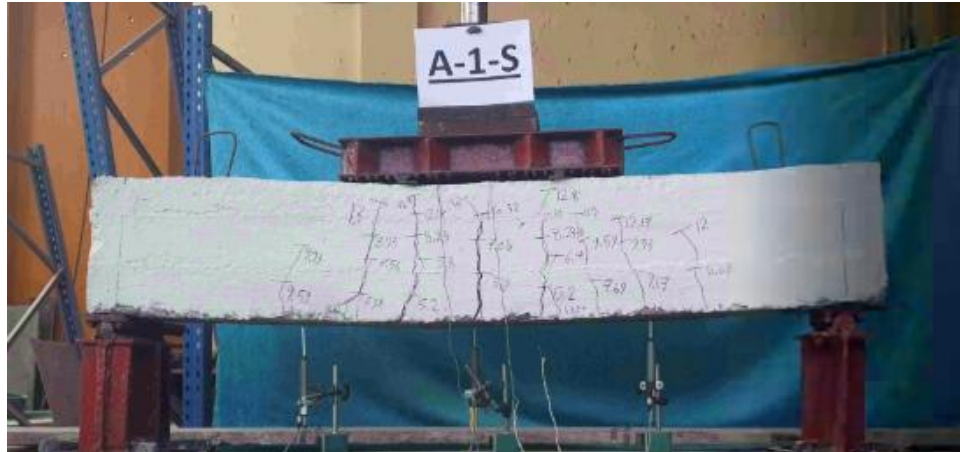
Conventional ductile flexural failure mode of steel A-1-S.
